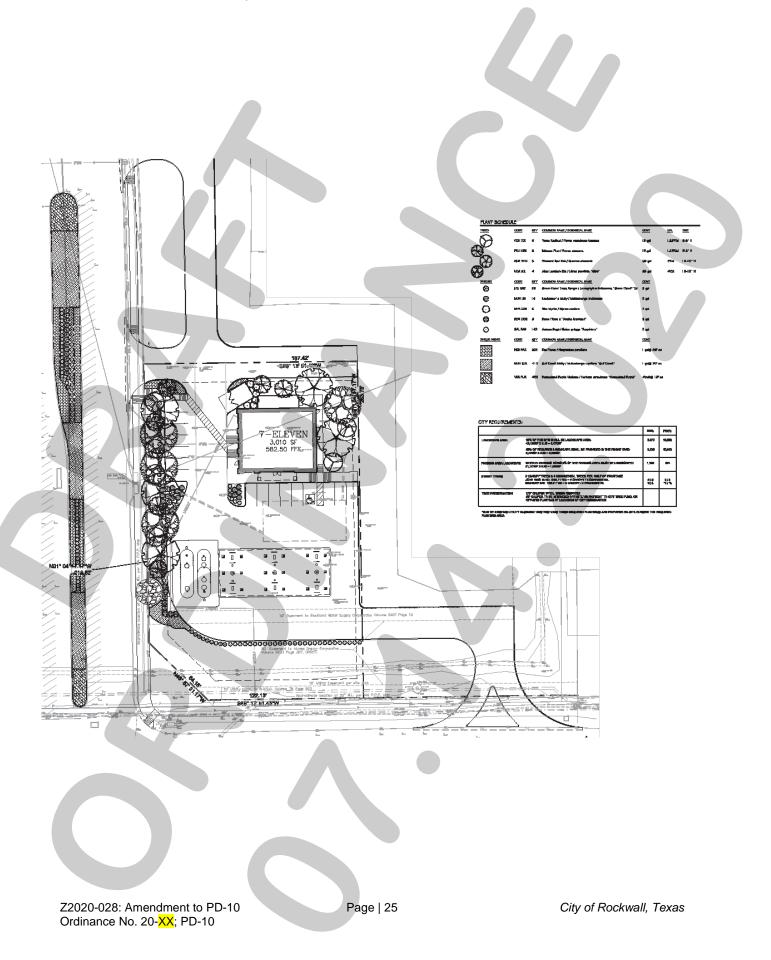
EXHIBIT 'G': Concept Plan and Elevations from Ordinance No. 12-13
